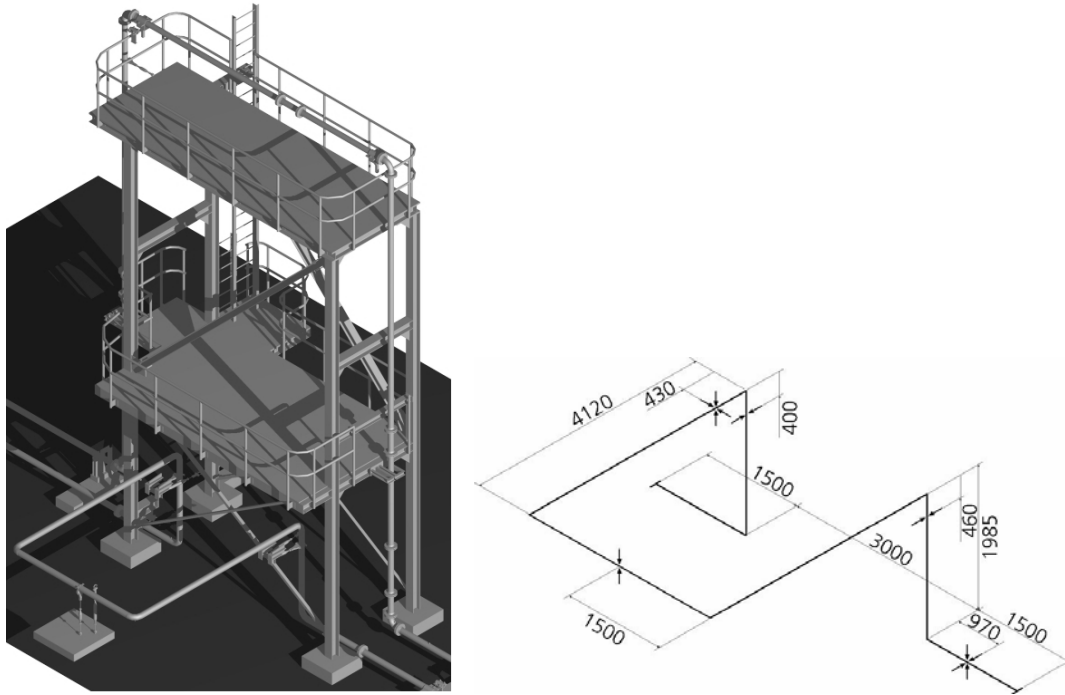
& 4. - : New construction of pipe bridge 2, extensions for FSI experiments and pipe support concept of new pipe bridge 2.
